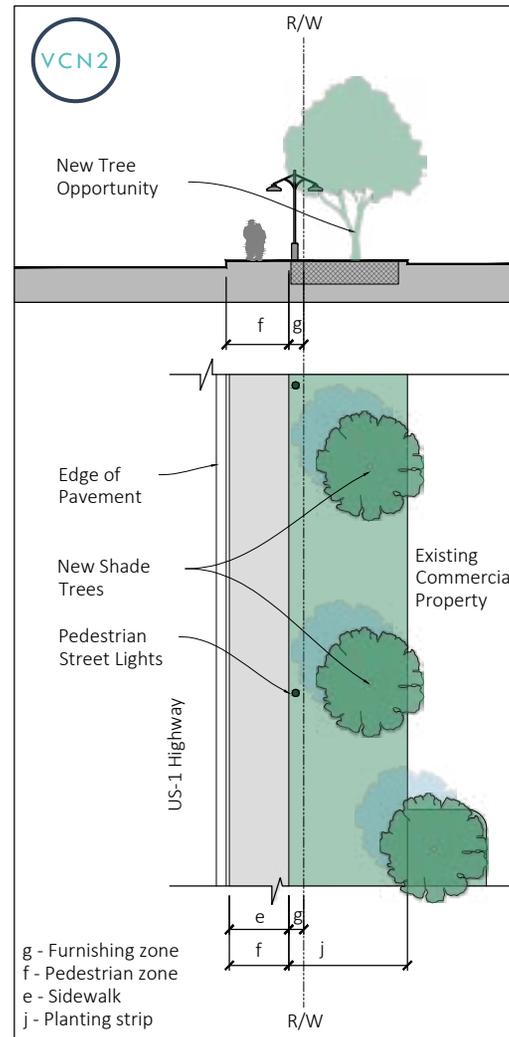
U.S. HIGHWAY 1 - STREETScape
